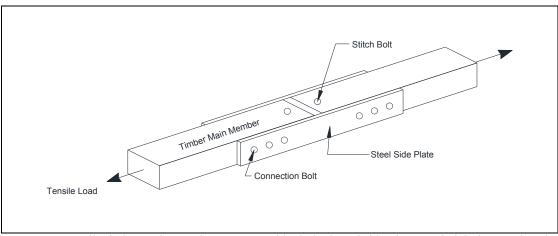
Tensile timber main members connected by bolted steel side plates. Stitch bolts are placed perpendicular to the connection bolts.
